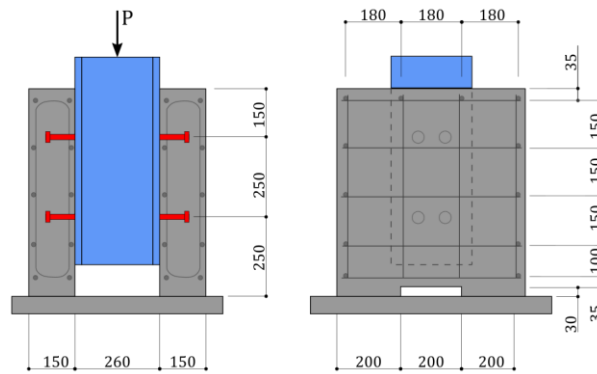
Layout of the standard push test assembly with recess [8]
